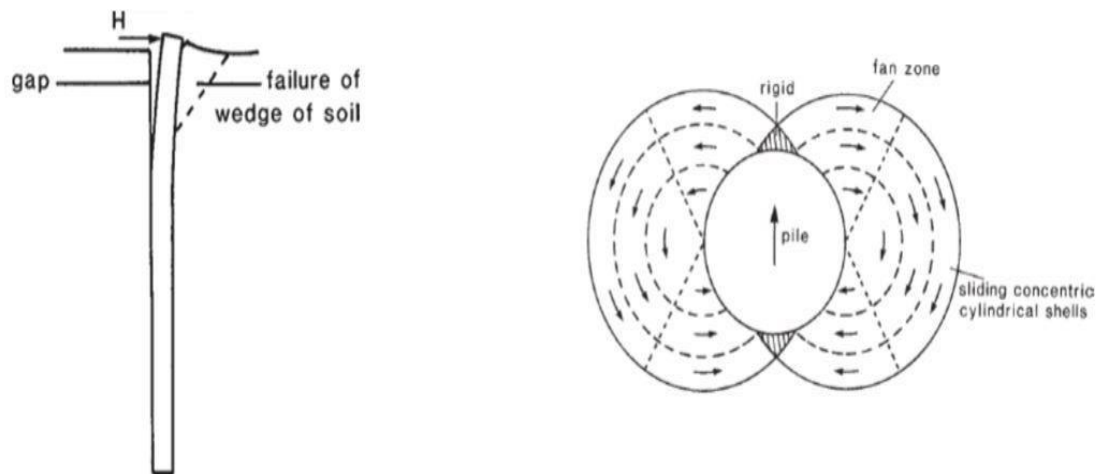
22 Pile Deformation and soil failure around a pile under lateral load
